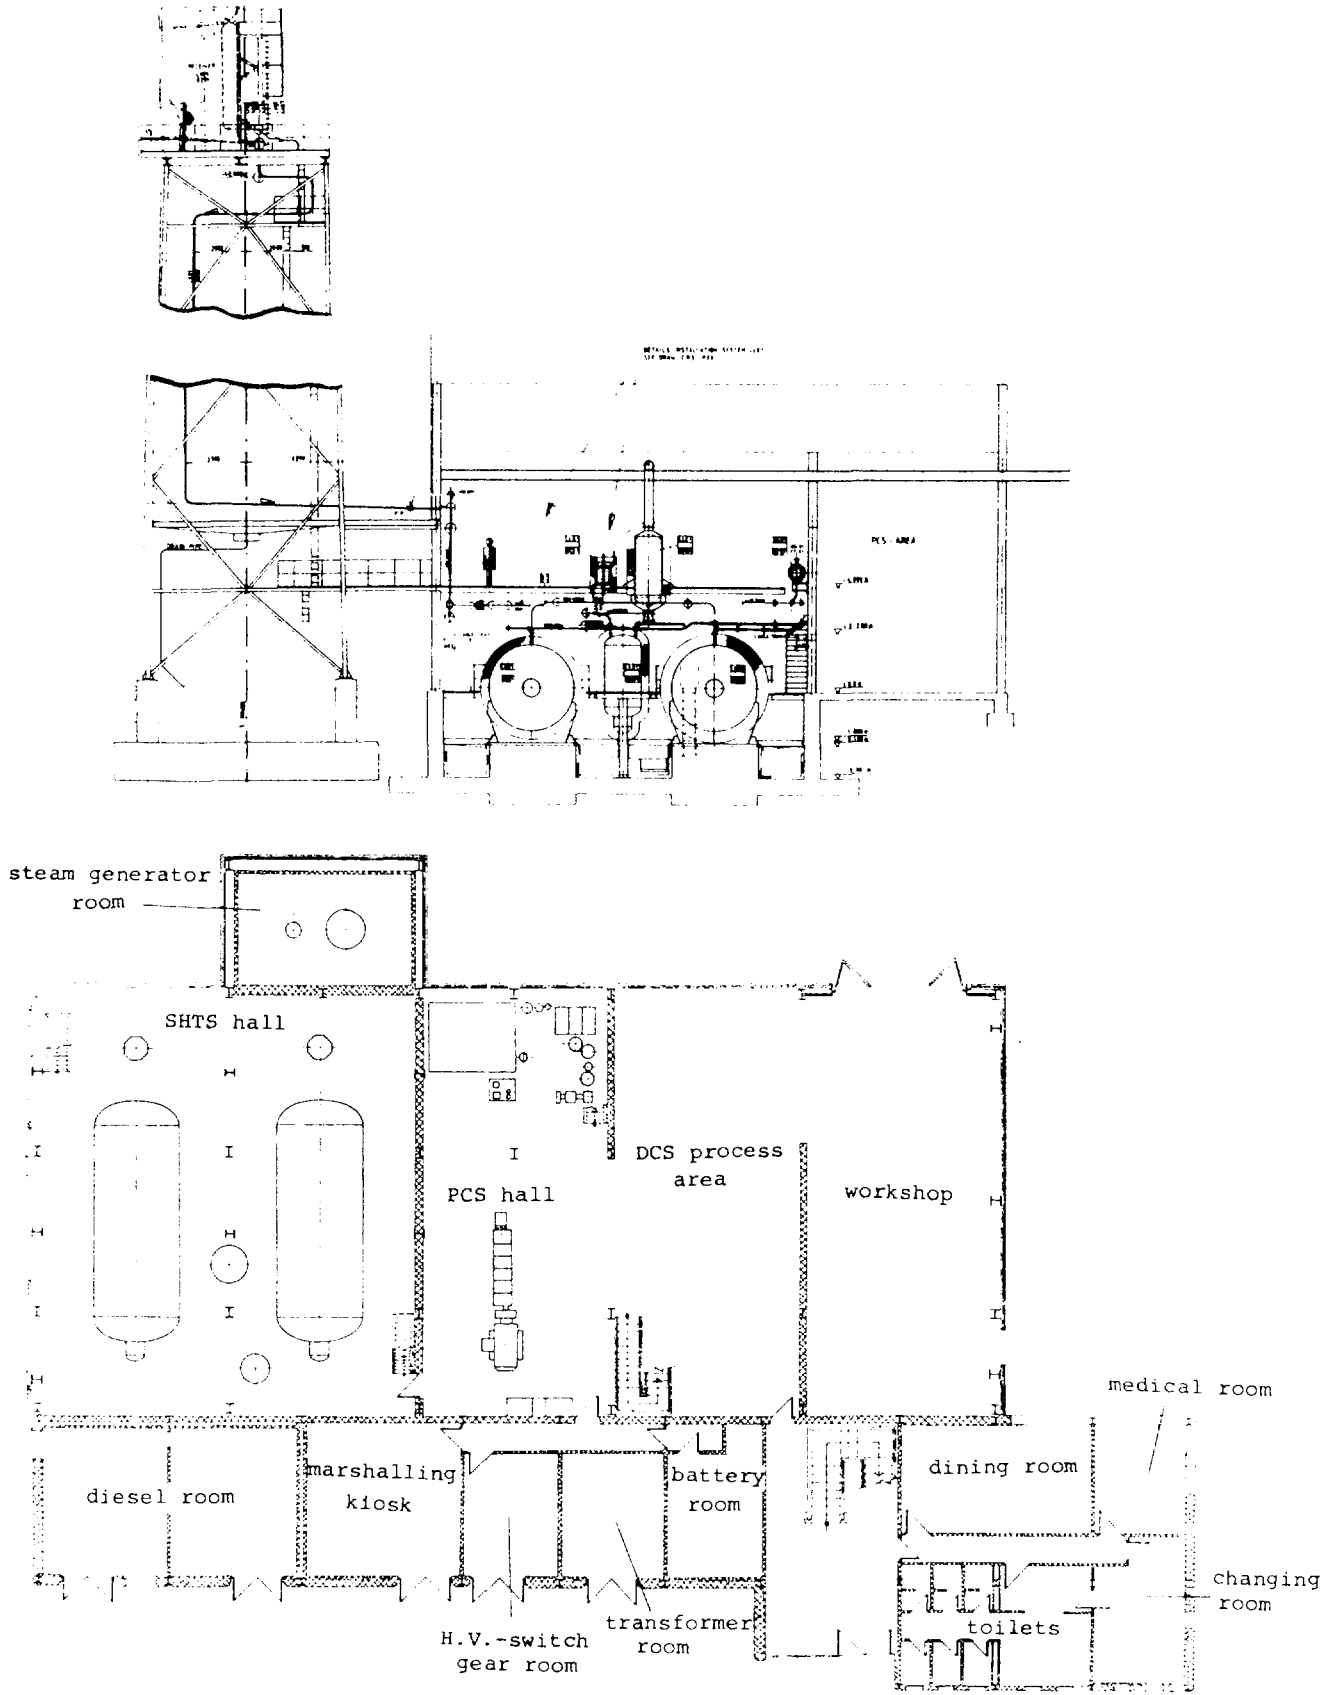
ALMERIA : IEA - SSPS PROJECT CRS - Building Plans
